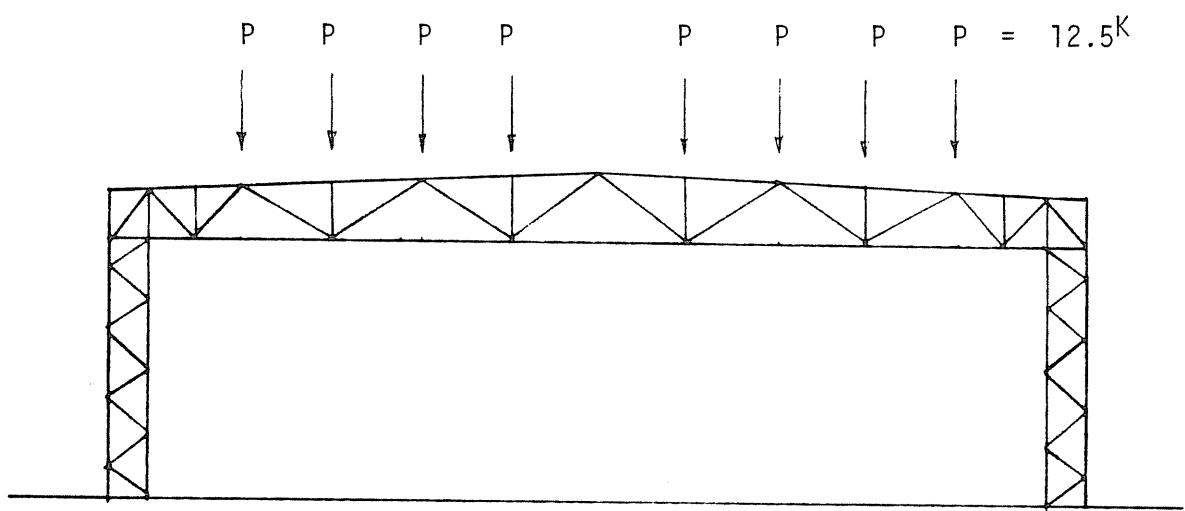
WEST FRAME, FULL LIVE LOAD TO FAILURE
